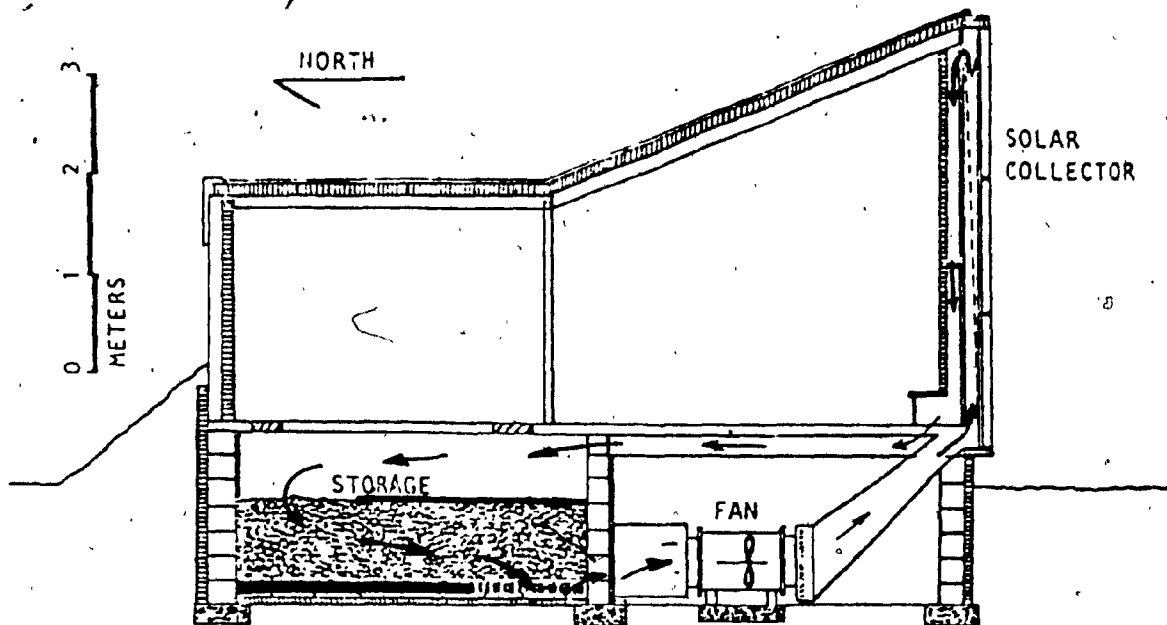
SECTION OF HOUSE AT LA MACAZA [ADAPTED FROM REF. 2]
